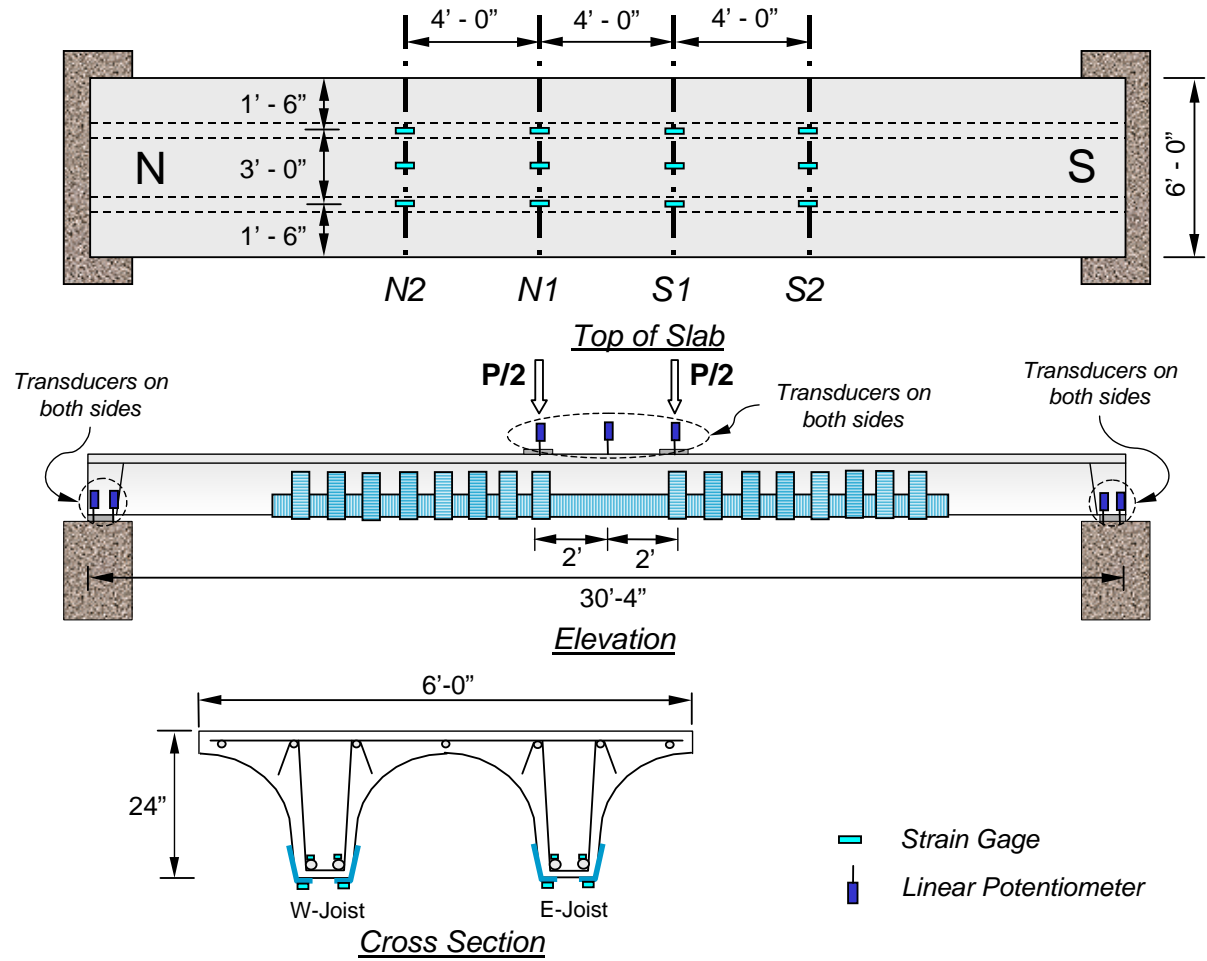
Location of Instrumented Sections Showing Position of Potentiometers and Strain Gages in Specimen J-2
